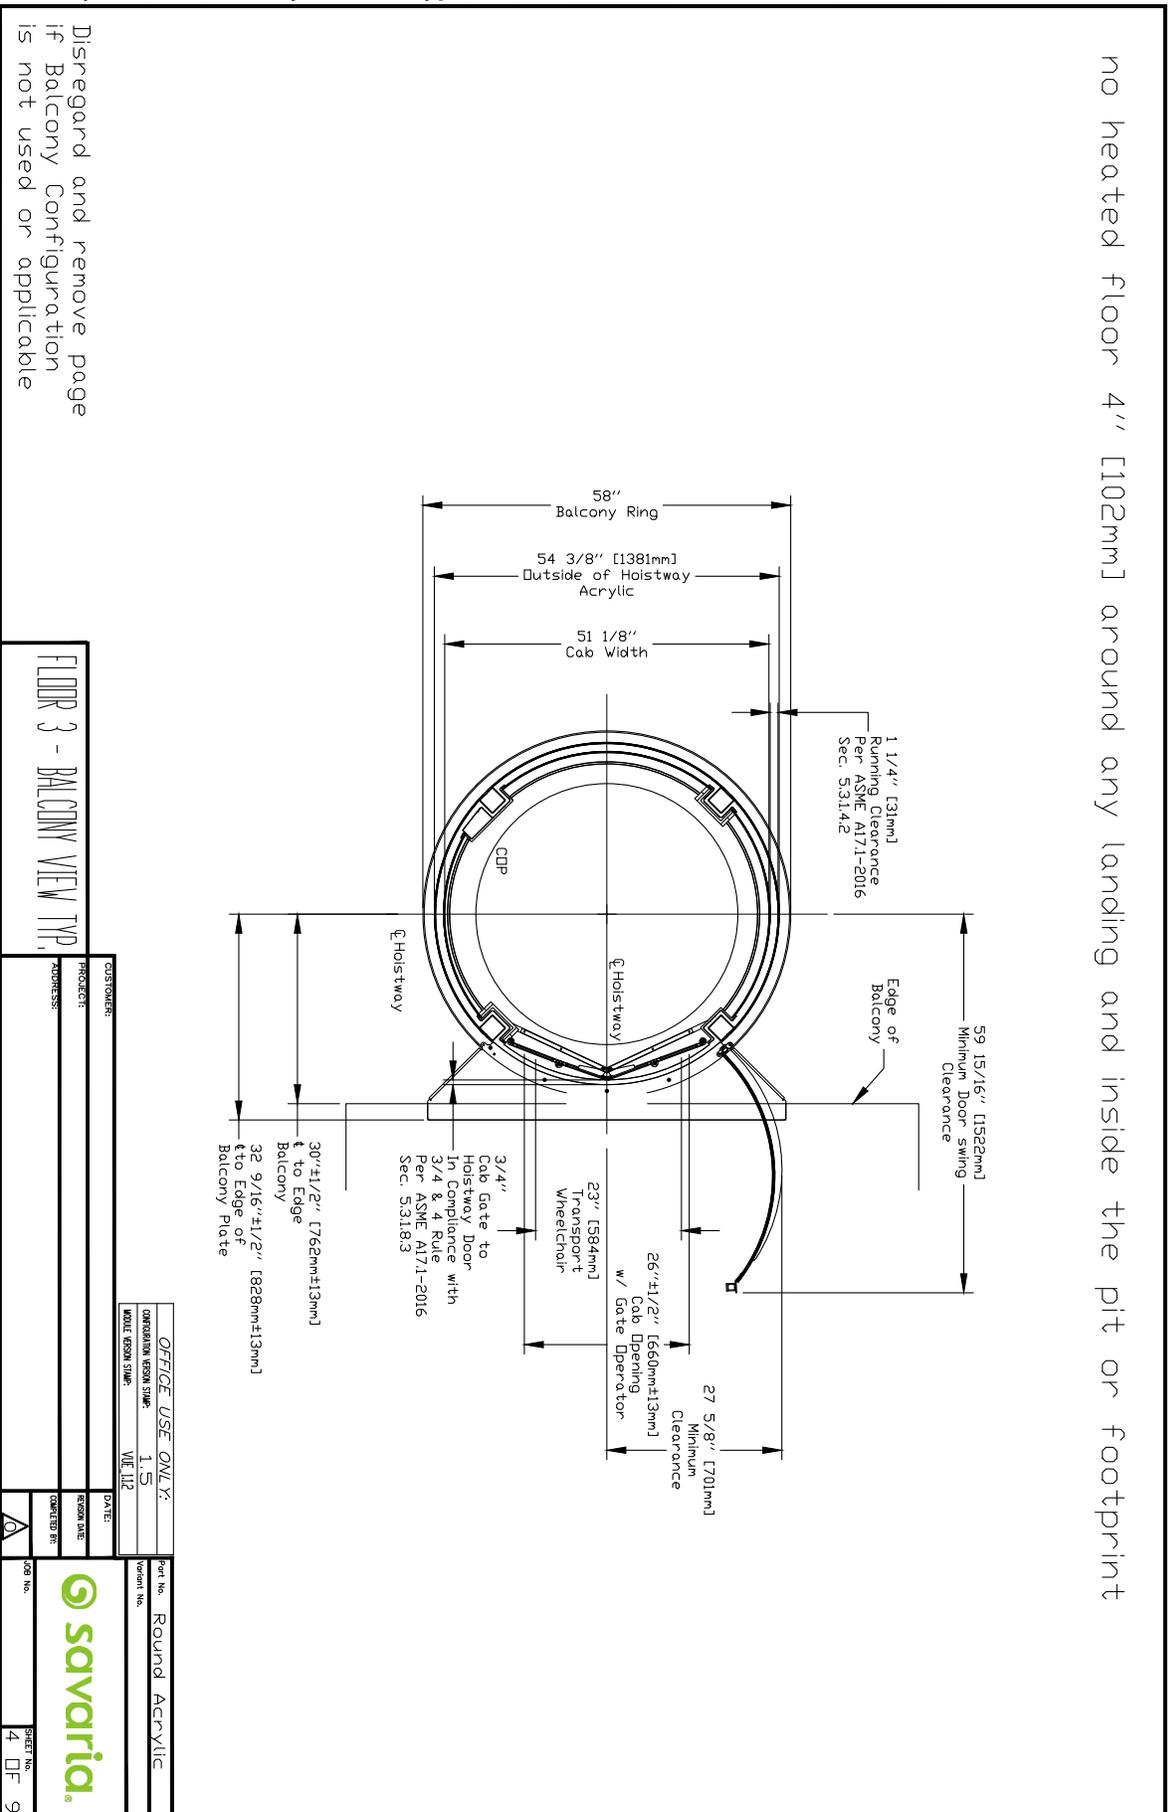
Balcony plate and handrail information - round acrylic (RAM) type 1 shown
